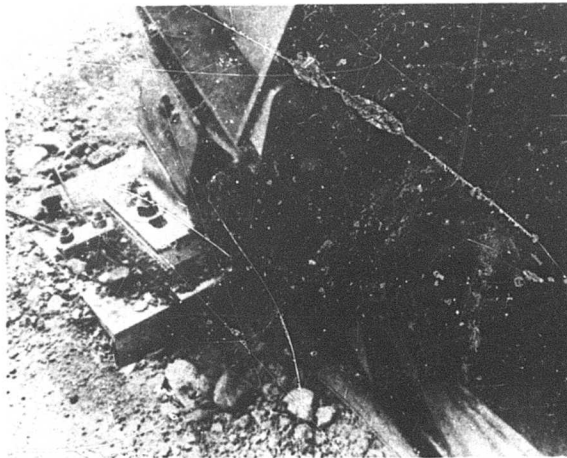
Fabric Flashing at the Bottom of the Door Panel
